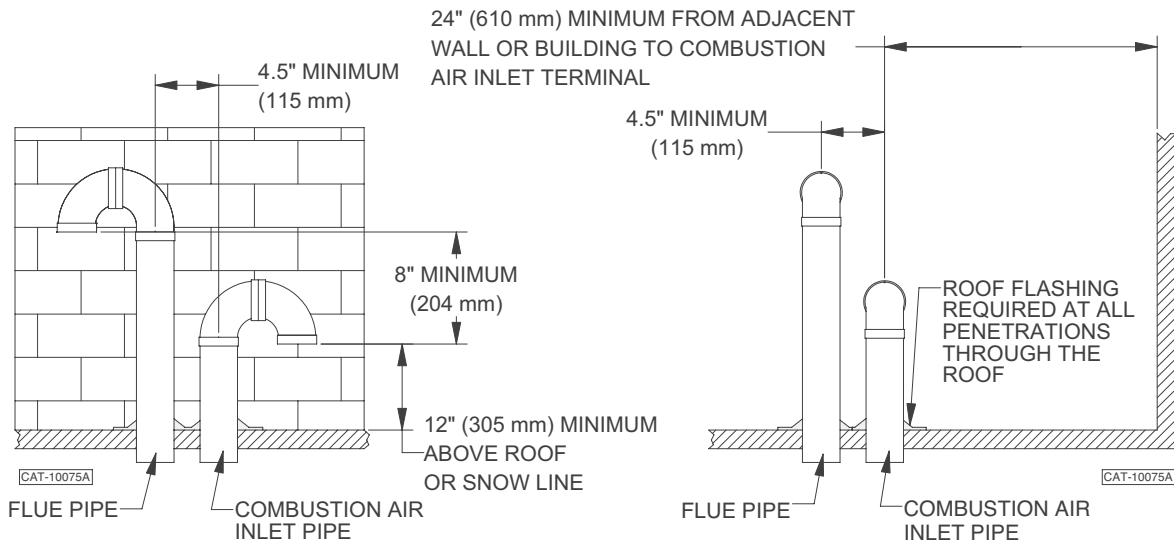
Vertical Two Pipe Separated Combustion Venting, Sloped Roof Termination
